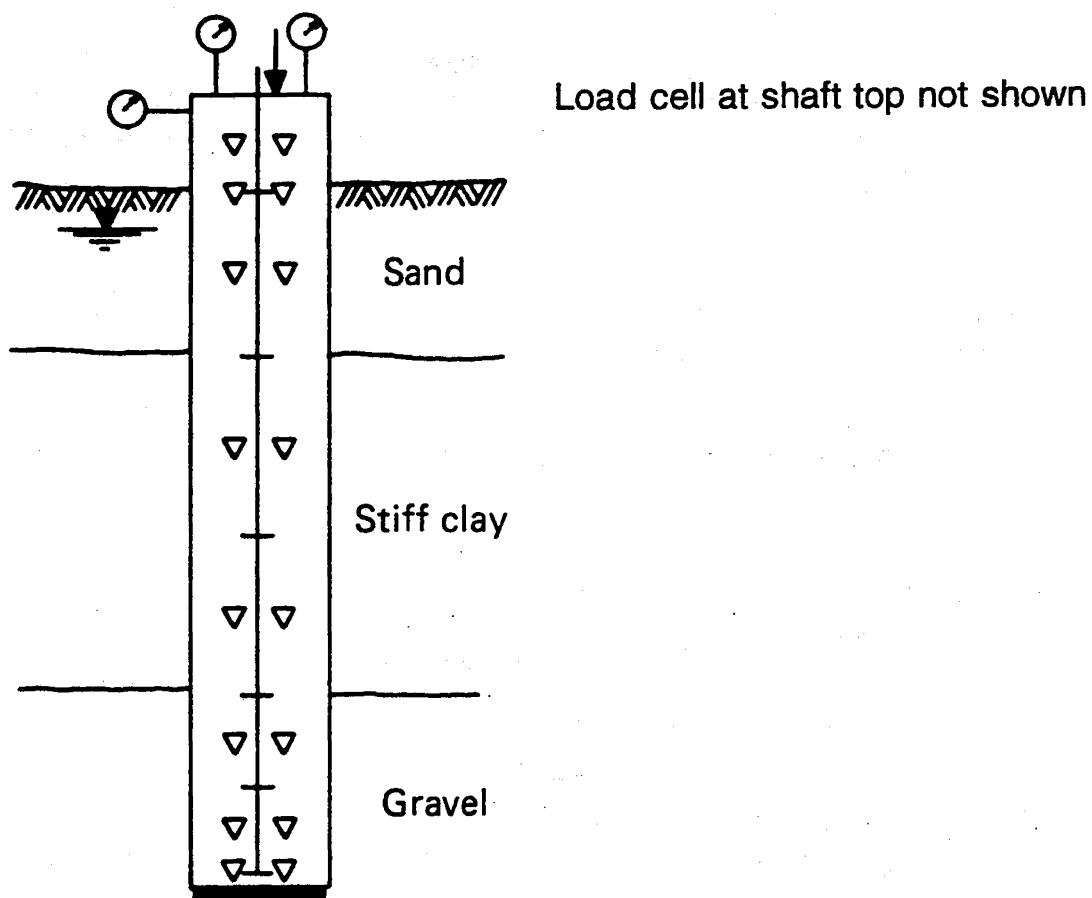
EXAMPLE: STATIC AXIAL LOAD TEST OF A CONCRETE PILE WITH COMPREHENSIVE LOAD TRANSFER DATA
